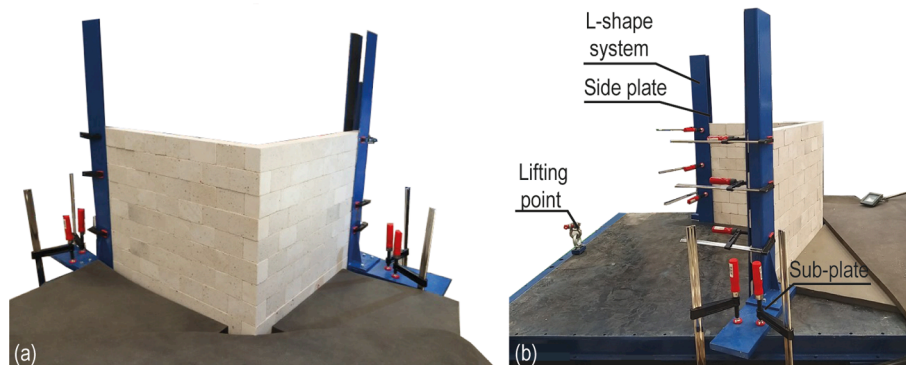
(a) Corner $5\pi/16$ test setup and (b) side view of the clamping system.
